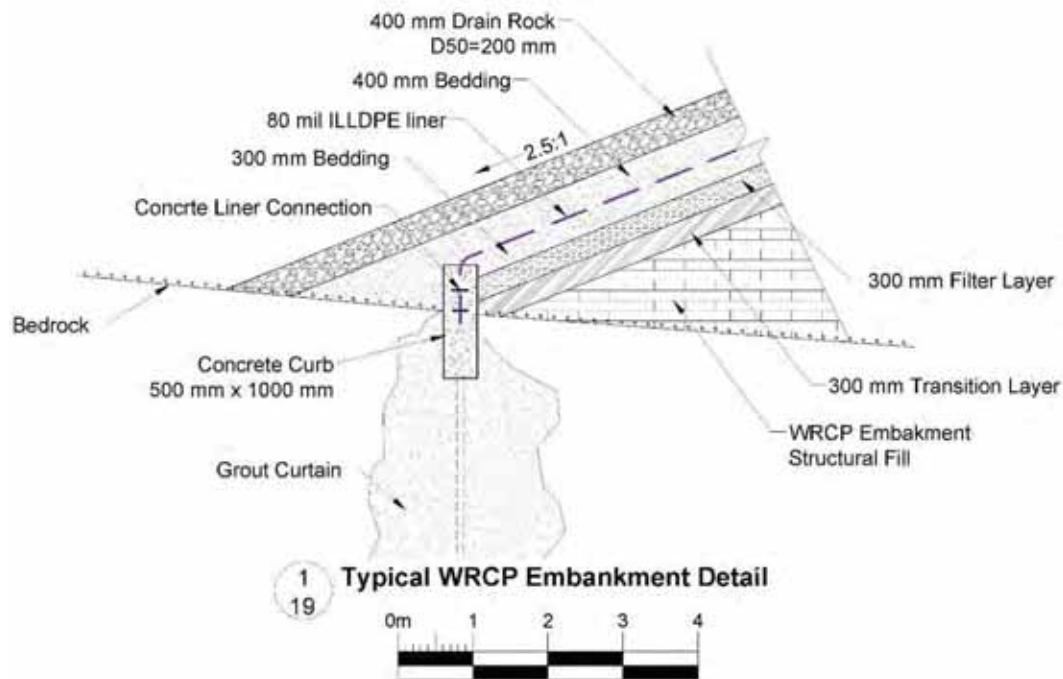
WRCP Typical Embankment Detail (SRK, 2020)
